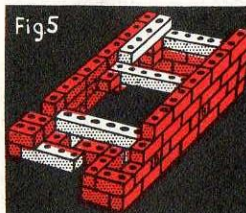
Section of back wall showing construction of roof. Bricks "BB" are also seen in Fig. 6.
